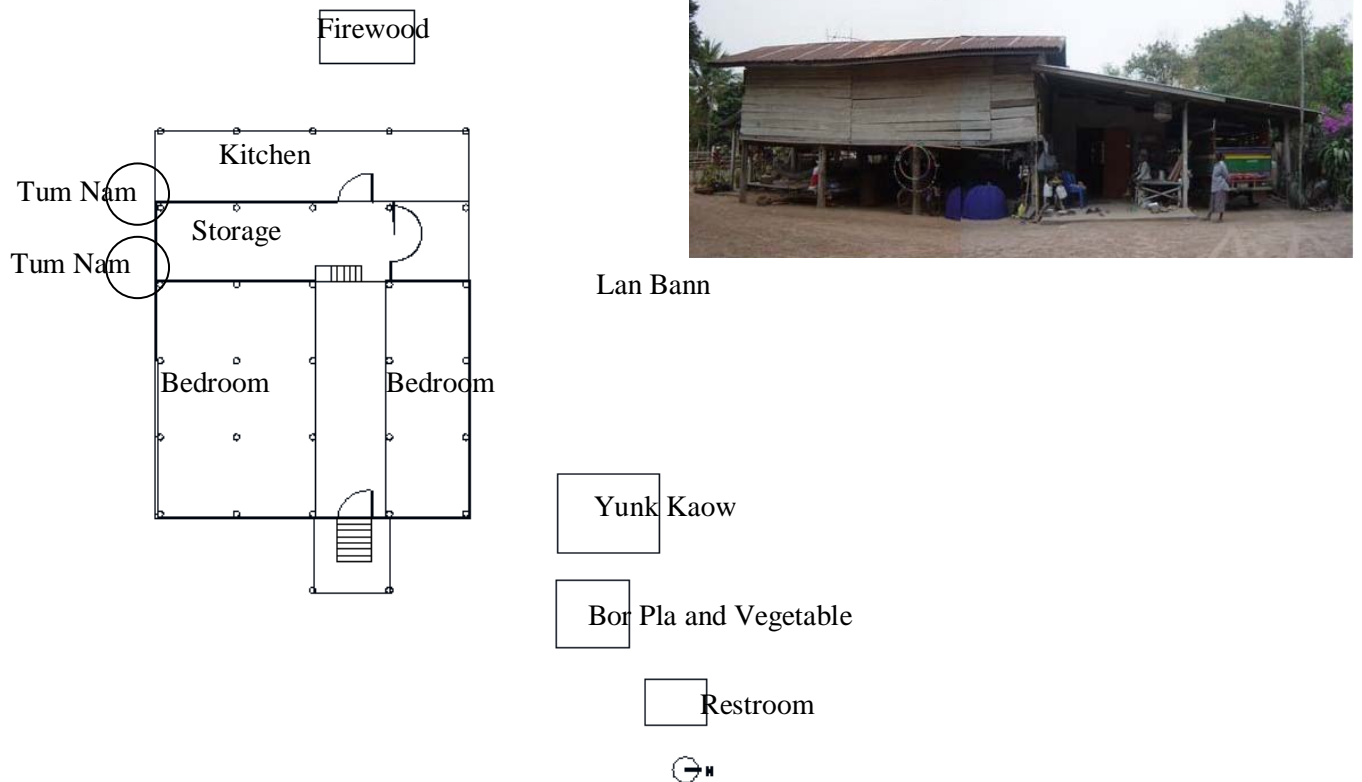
Picture and Plan of Mrs. Fai Thongsooknork's house
